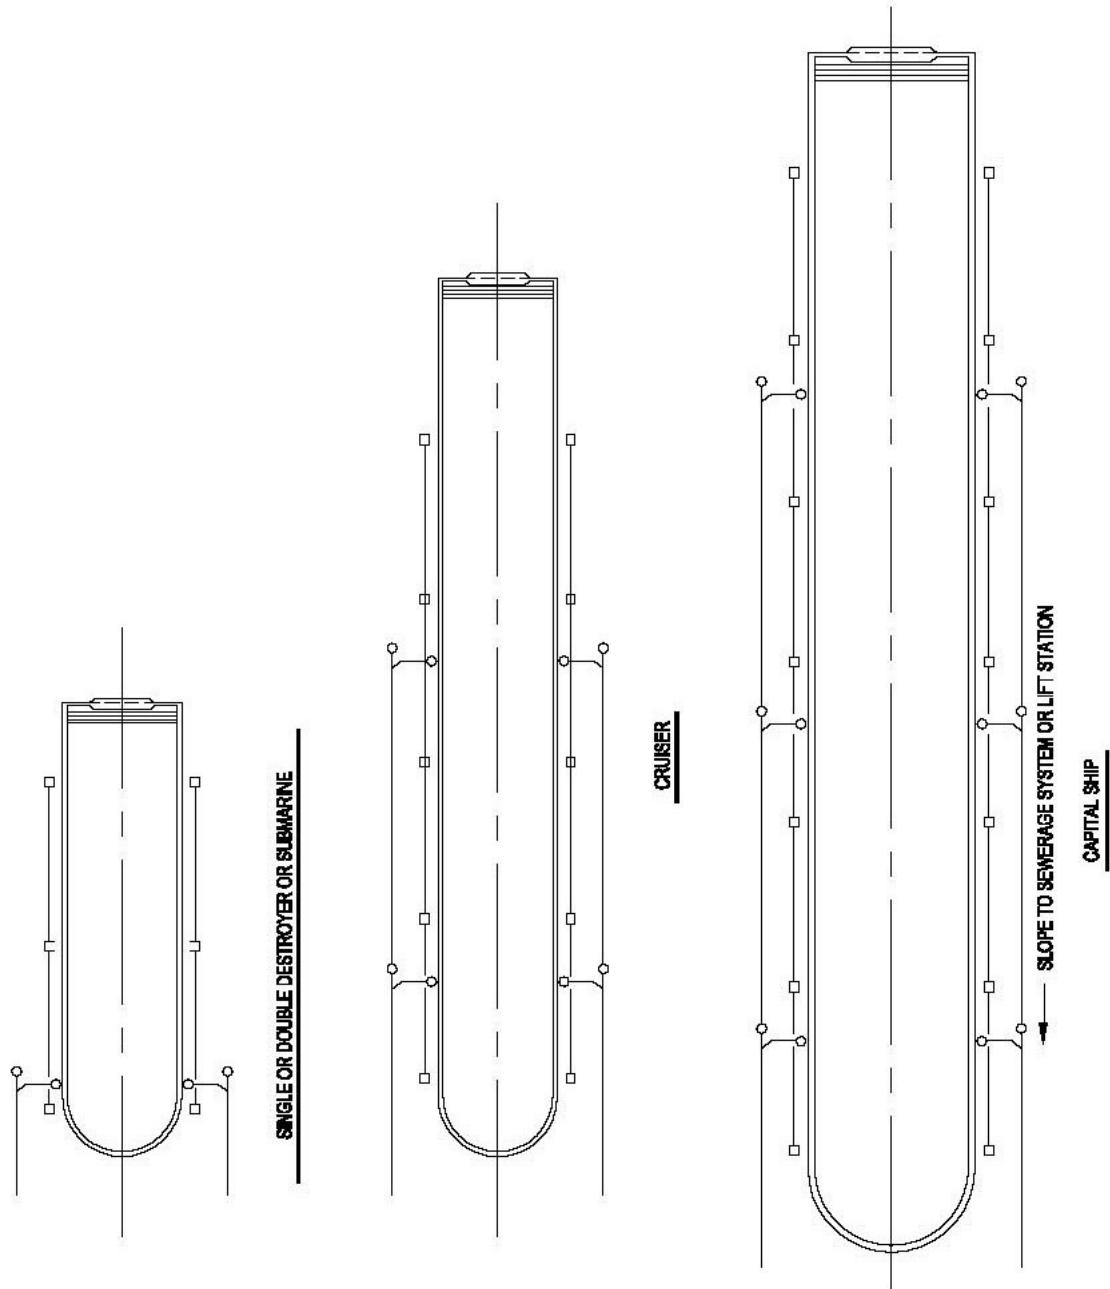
B Typical Sewage System Layouts for Drydock Facilities (2 of 2)
